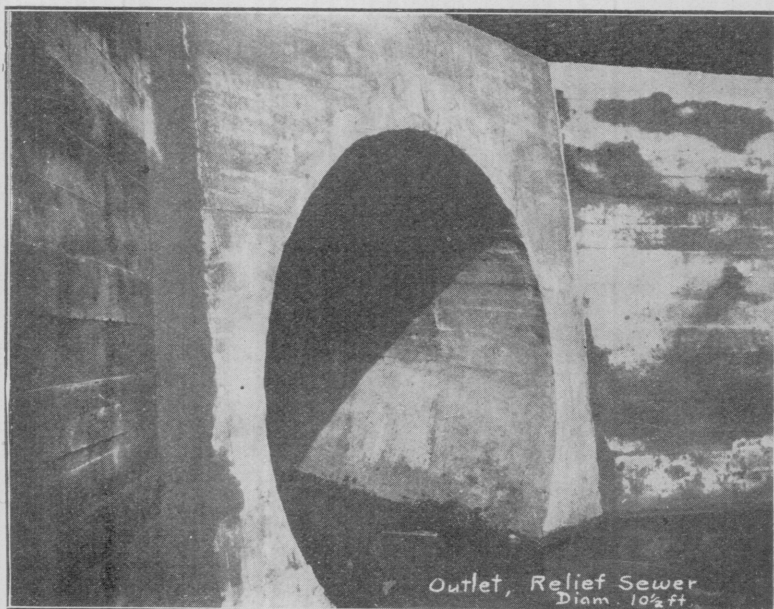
Outlet of the Relief Sewer, Columbus, Ohio.
